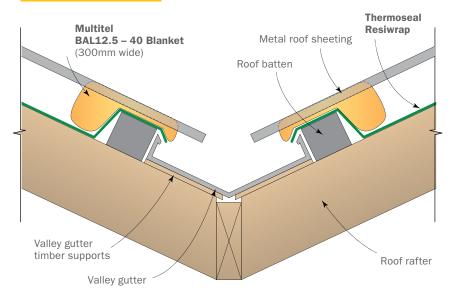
b Valley Detail - Steel Roof (BAL-12.5 - BAL-40)
